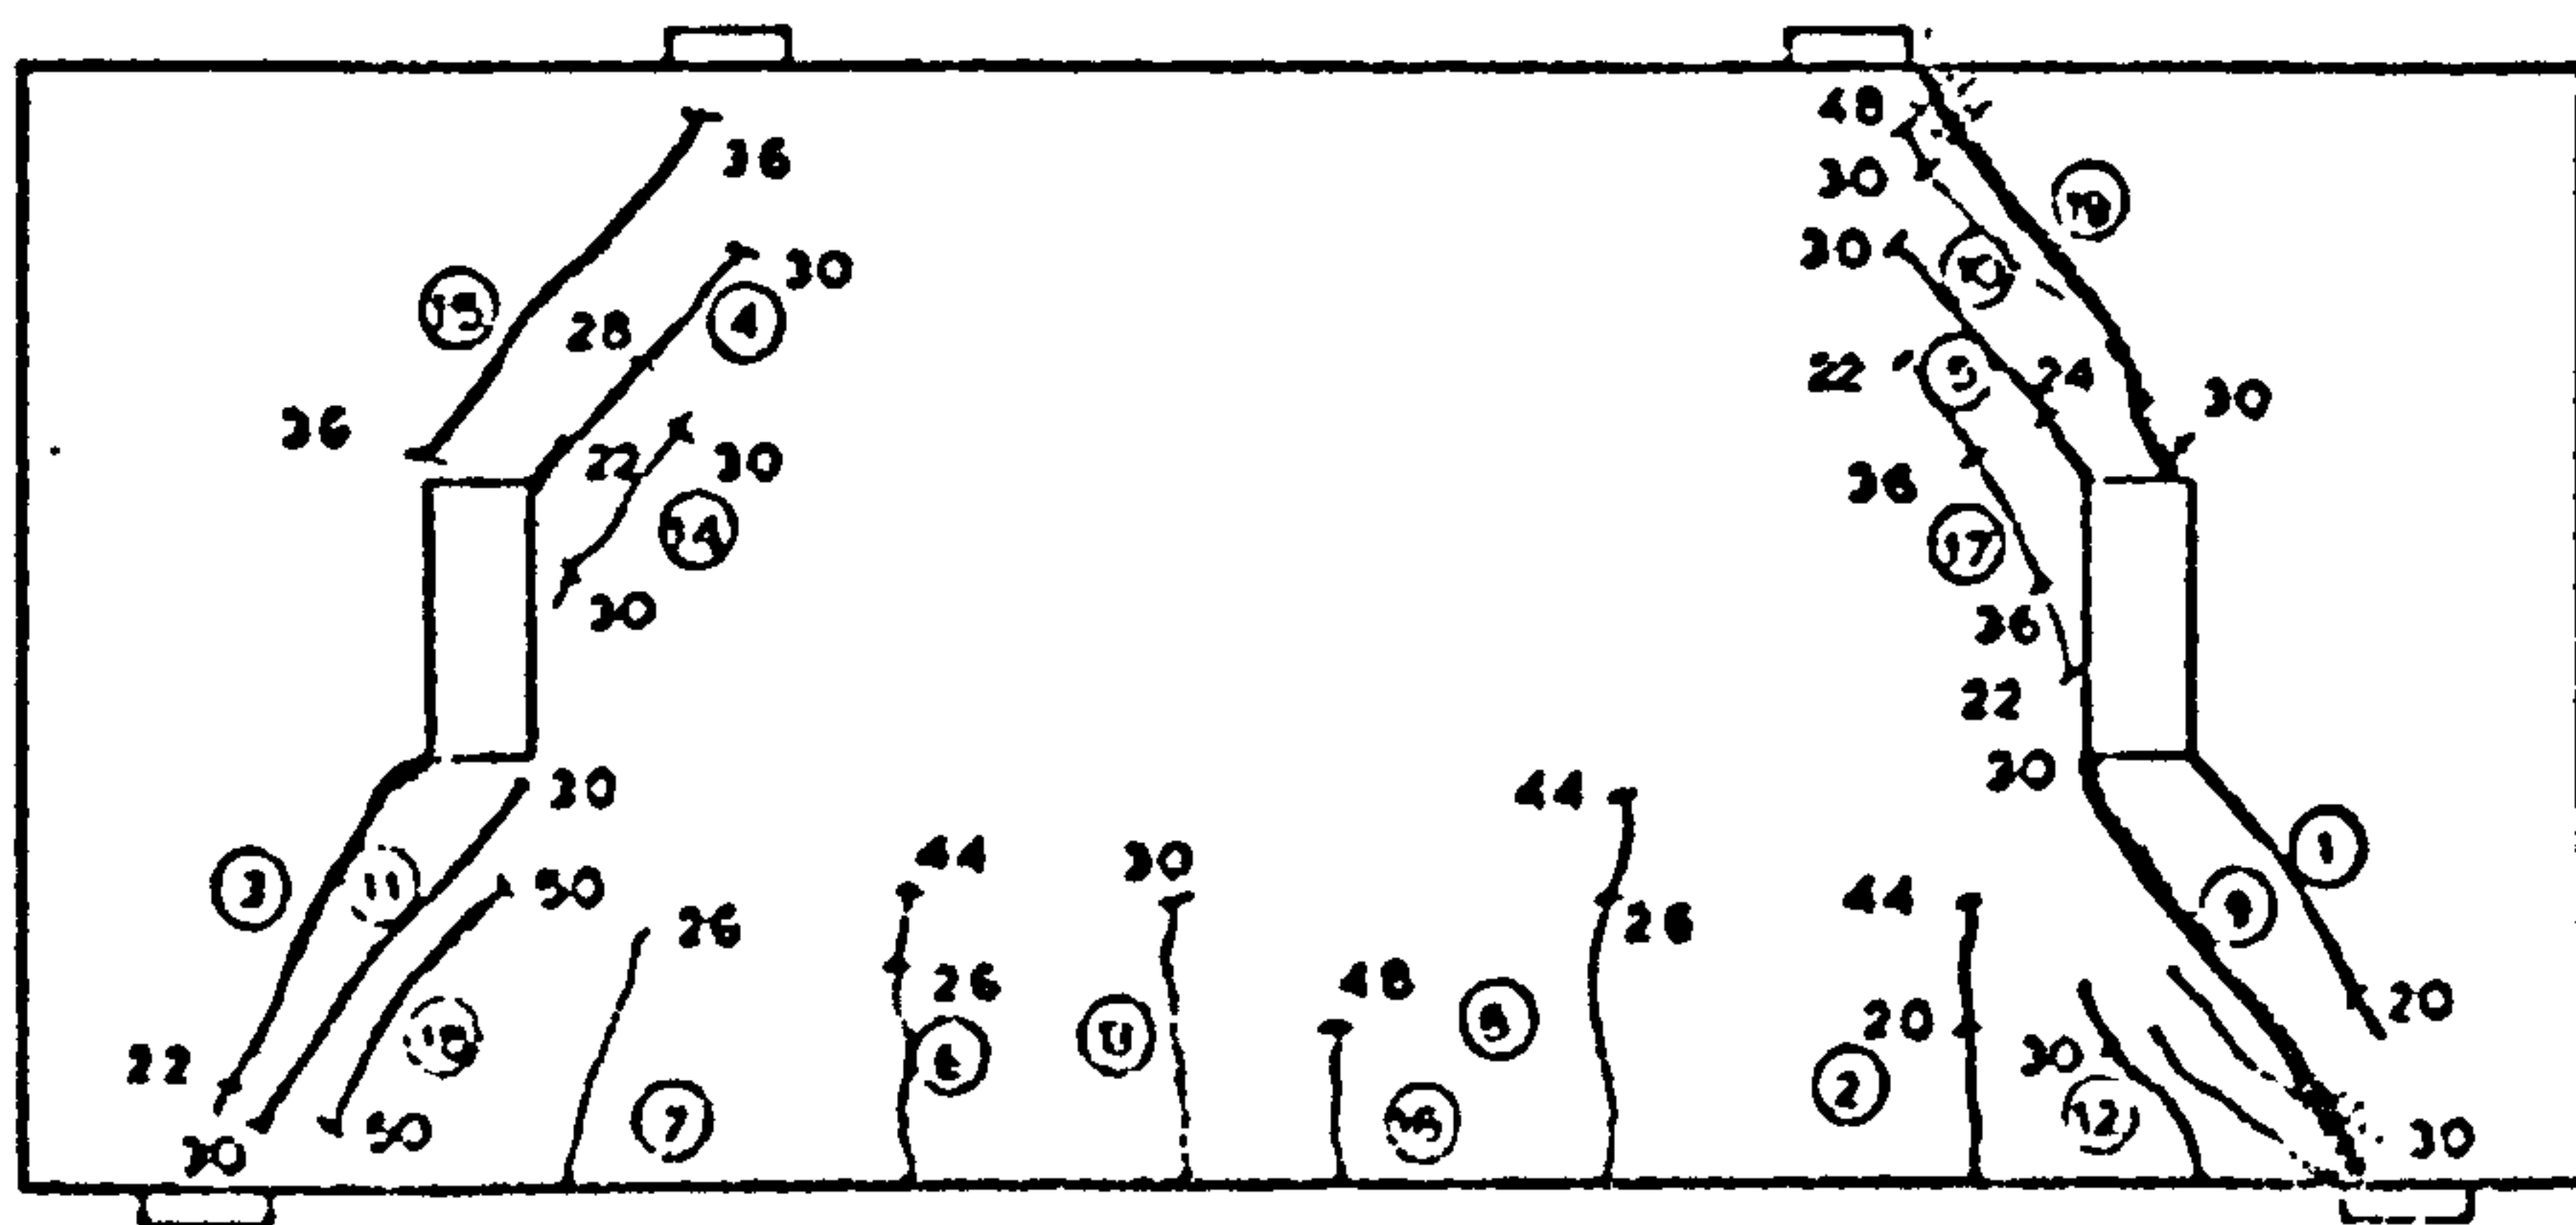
TYPICAL CRACK PATTERNS AT FAILURE
